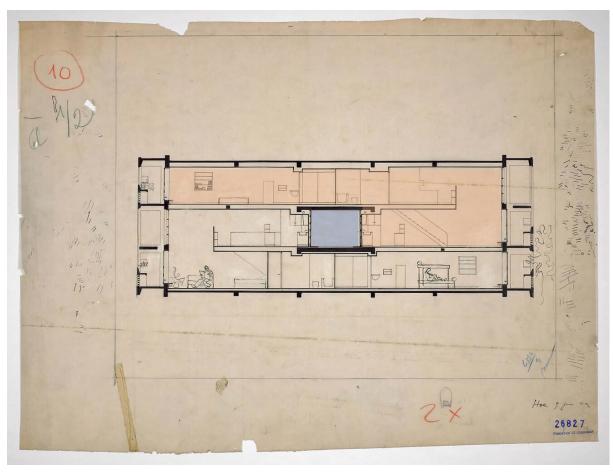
Unité d'habitation. Section study drawing, 3 levels elevation with arrangement of furniture, silhouettes. (Highlights added by thesis author)
